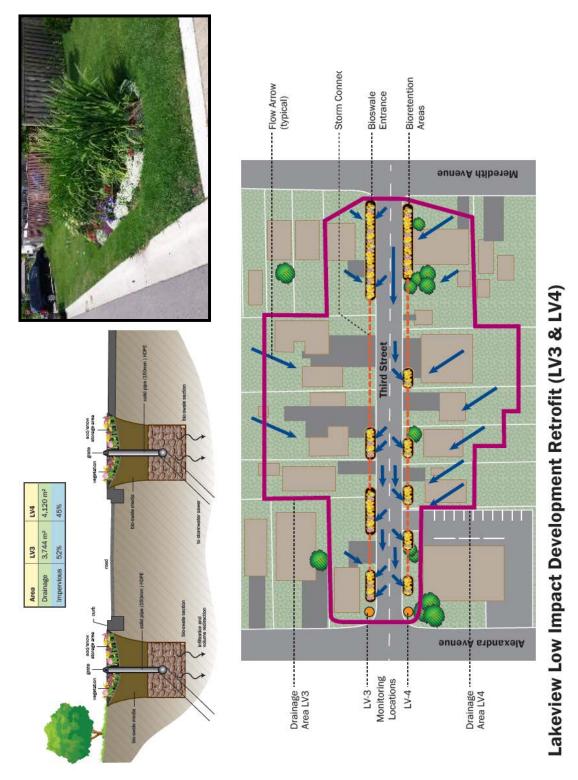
Overview of bioswale cross-sections and locations on Third Street with arrows showing direction of stormwater flow
